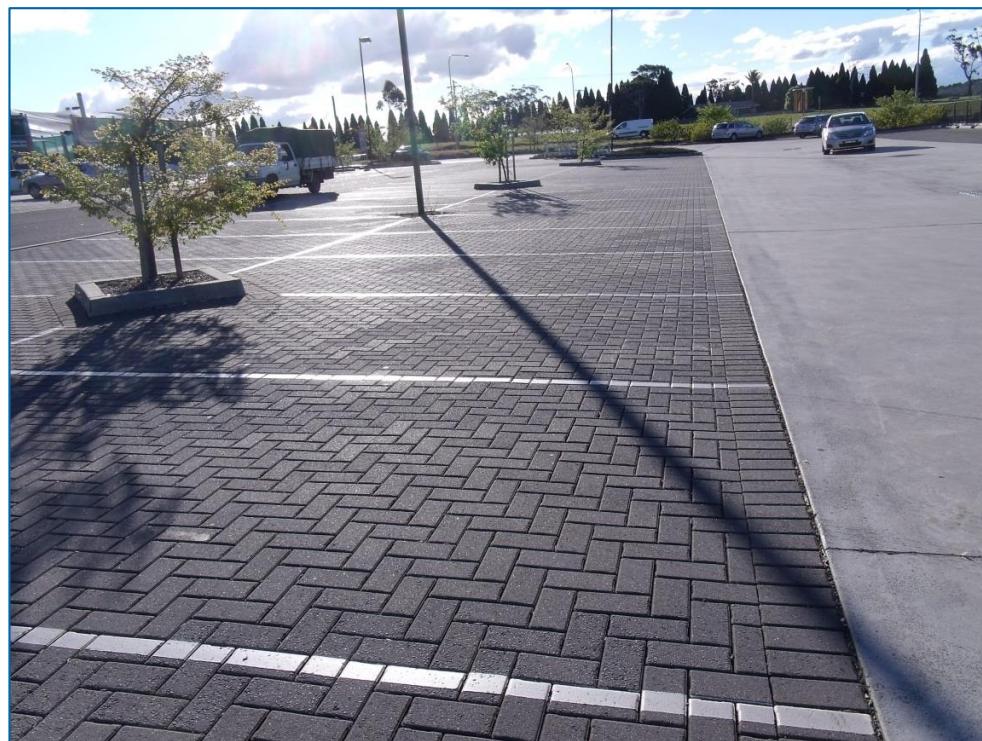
Permeable pavement to harvest stormwater runoff at Bunnings
